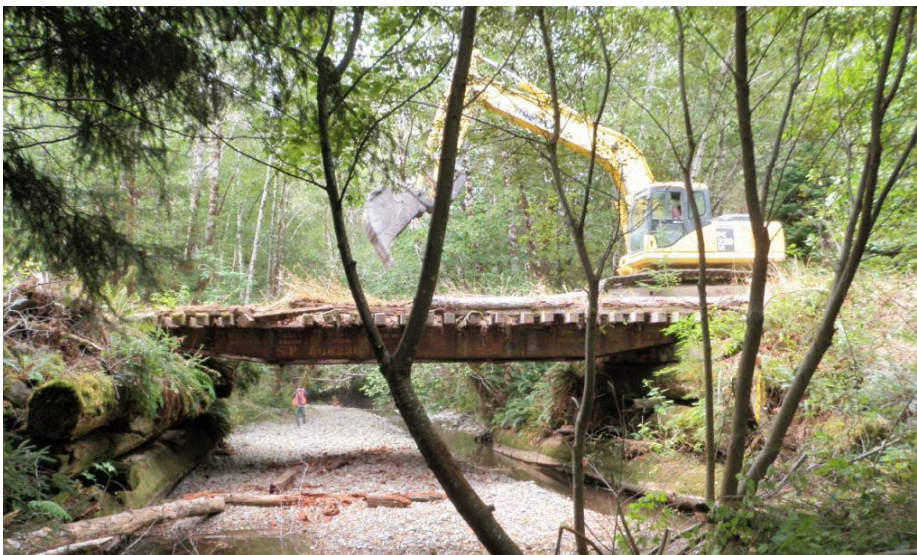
A. Abandoned road and flatcar bridge over a large fish bearing stream. Unlike log stringer bridges, which are often covered with a thick layer of soil, flatcar bridges do not have a cap of soil that could enter the stream when they eventually fail. However, the log abutments were beginning to collapse and the collapsed logs and bridge would likely cause future flow deflections and channel erosion.
